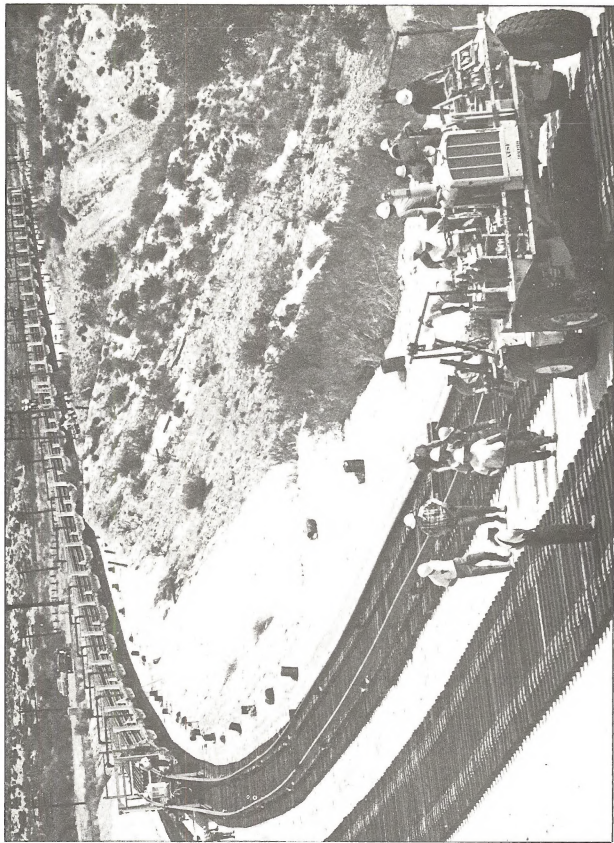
A "straddle buggy" pulling continuous welded rail into position.
